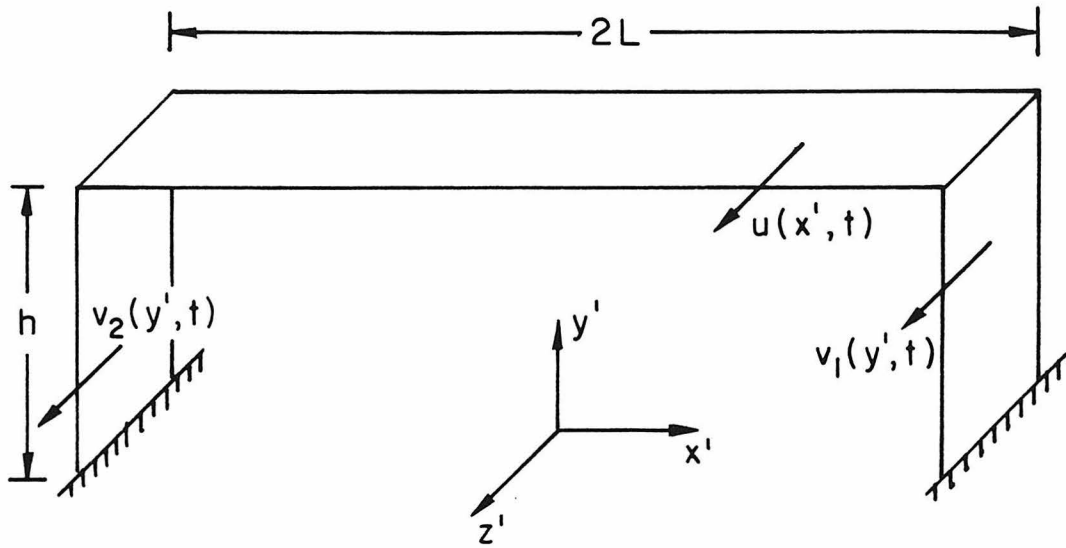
MODEL OF A ONE-STORY BUILDING WITH TWO END WALLS.
